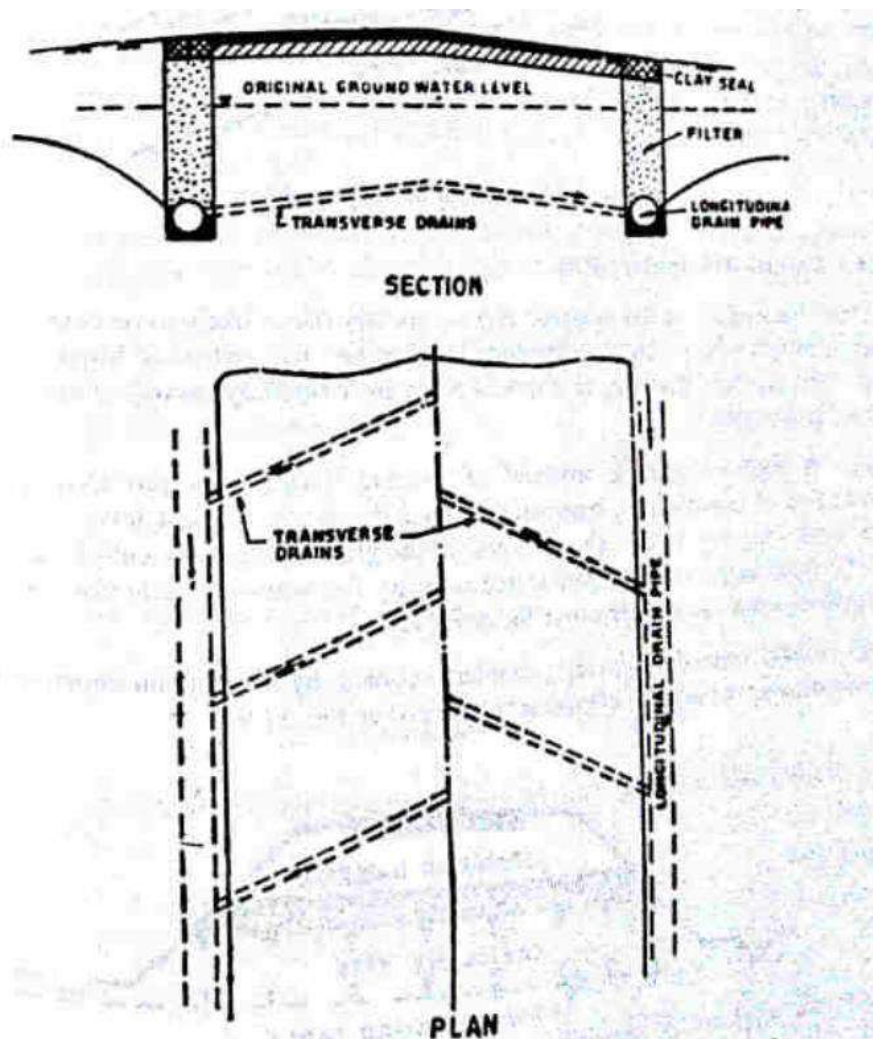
Transverse and longitudinal section of subsurface drainage system (source: Khanna & Justo)
